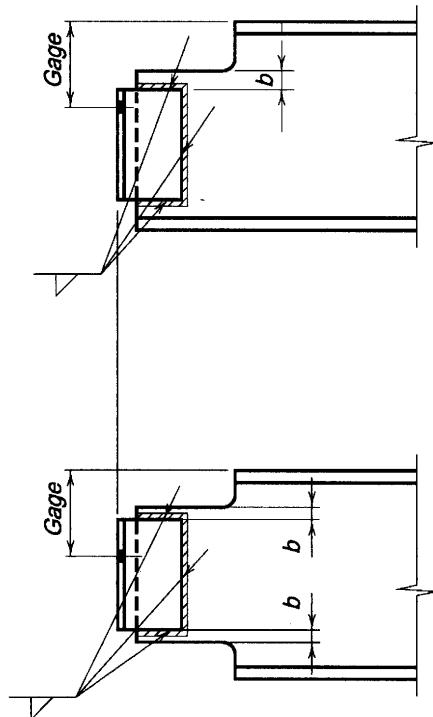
Illustration of shelf dimensions for fillet welding.
